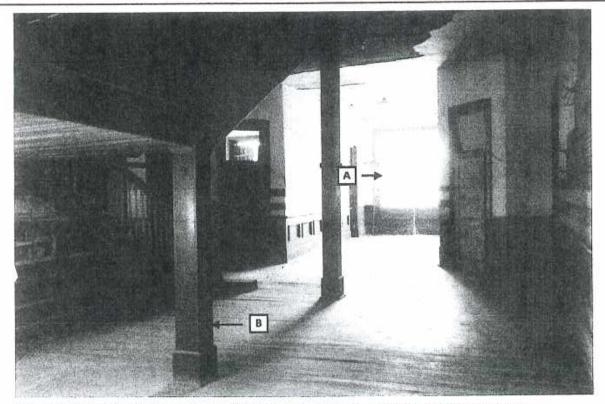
Main Entry Stair Hall view east. (A) Door Type 2 - Exterior Level 2 Entry, (B) Maple box column.
